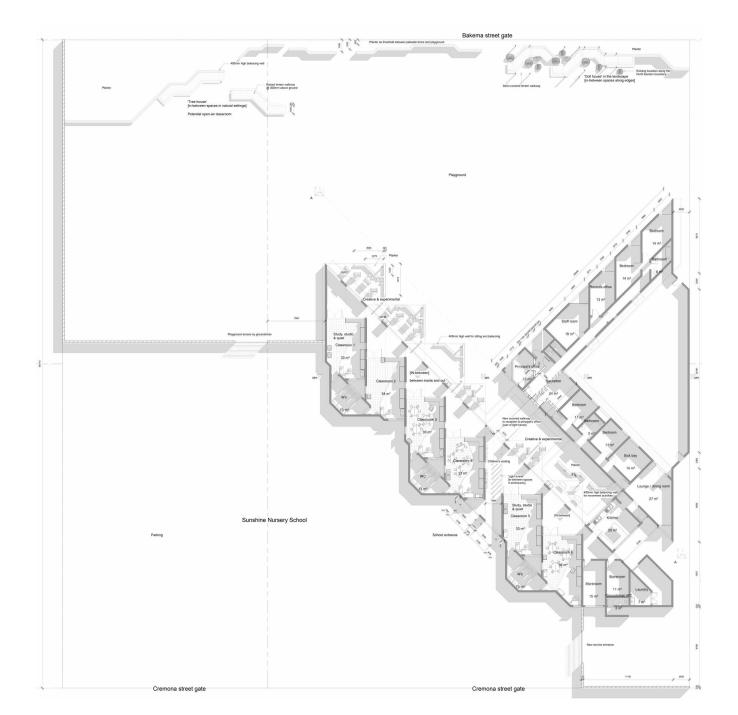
Ground floor plan, iteration 1 (Author, 2020)
